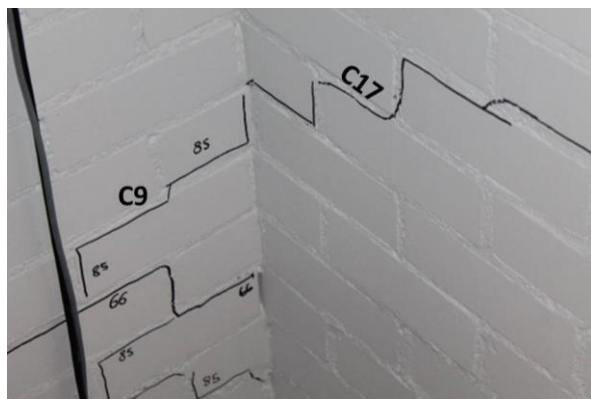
EQ-NPR 85% cracks – North clay façade.
